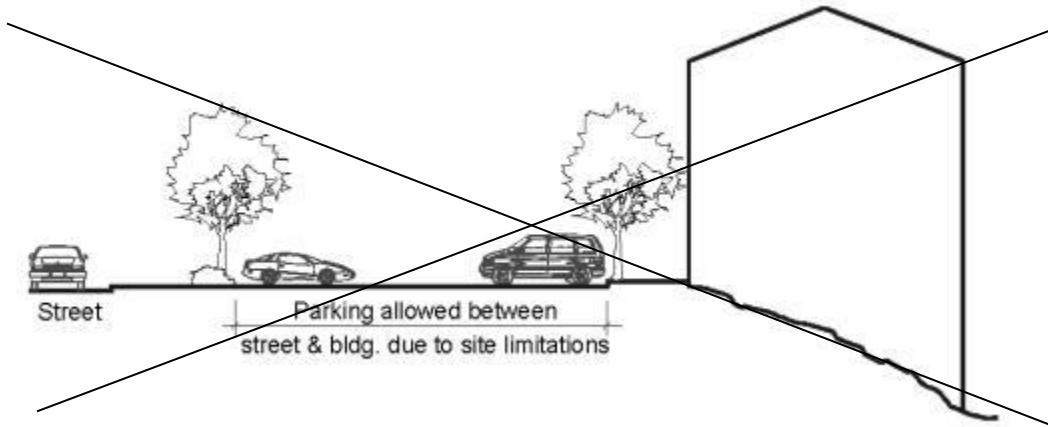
(C): Example of parking location between the building and the street, which is necessary due to the steep slope.
